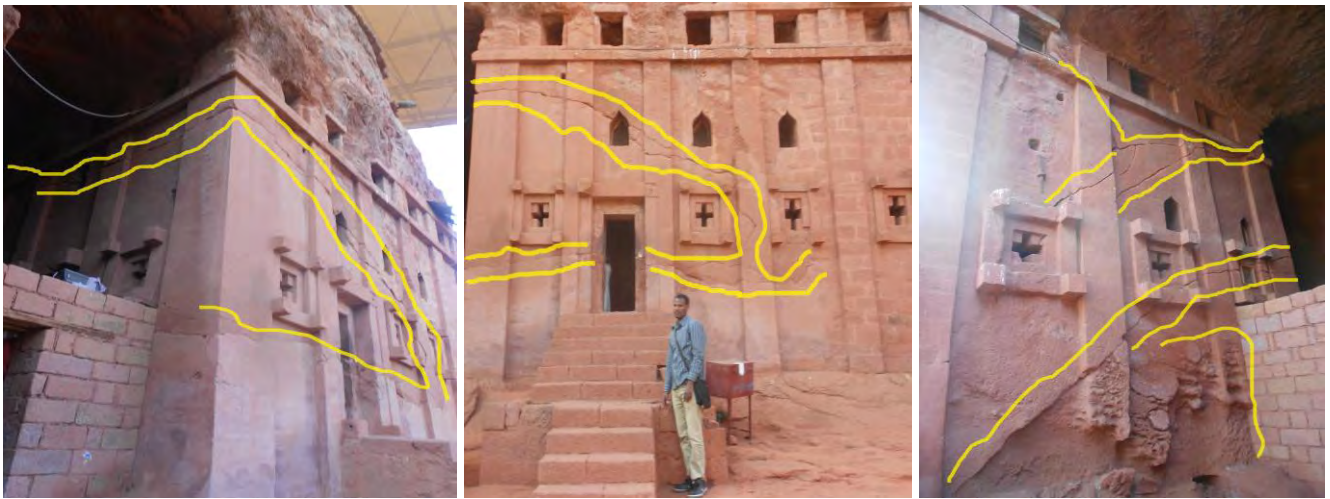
The pattern of cracks at Bete Abba Libanos (External); as you show the crack circled through the three sides of the church and at the base of the church shows high deterioration of the wall.
